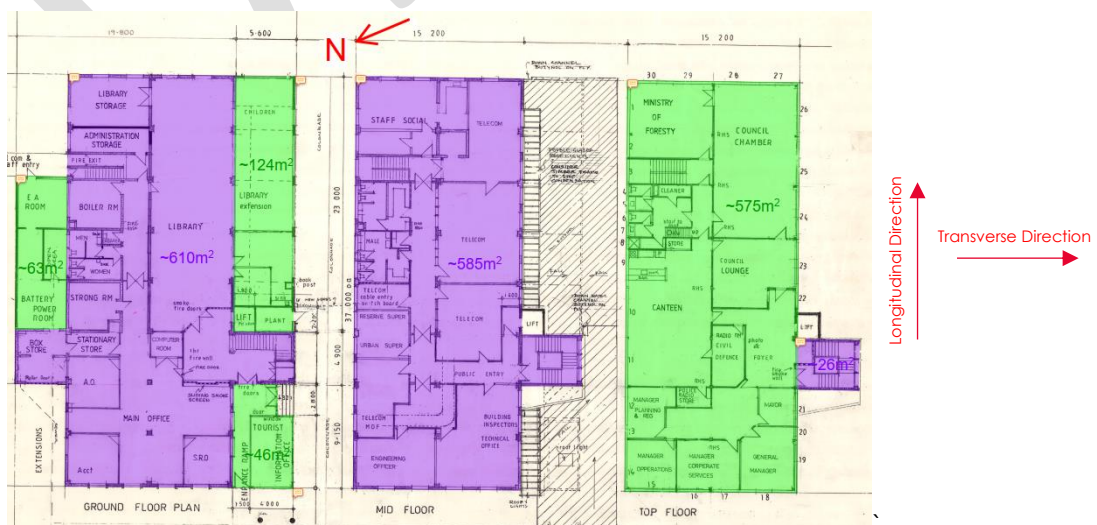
Floor plans indicating original construction (purple) vs later stage extensions (green)
